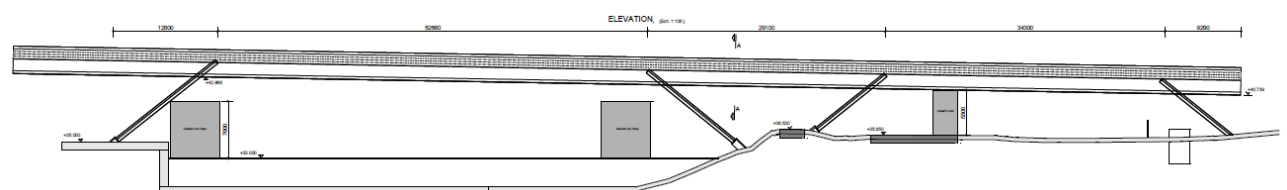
Pre-Design Proposal 3 - Frame Bridge - Steel and Concrete - Bureau Greisch
